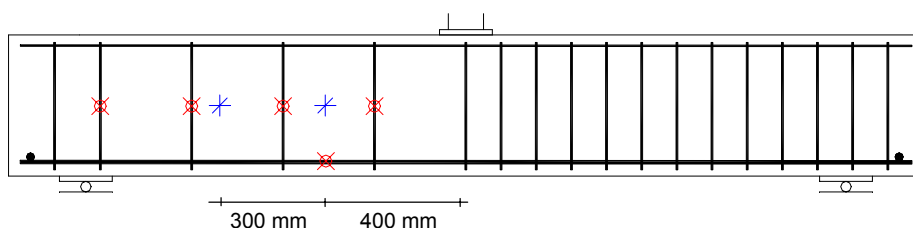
Typical strain gauge location for beam specimens H60 and H75
